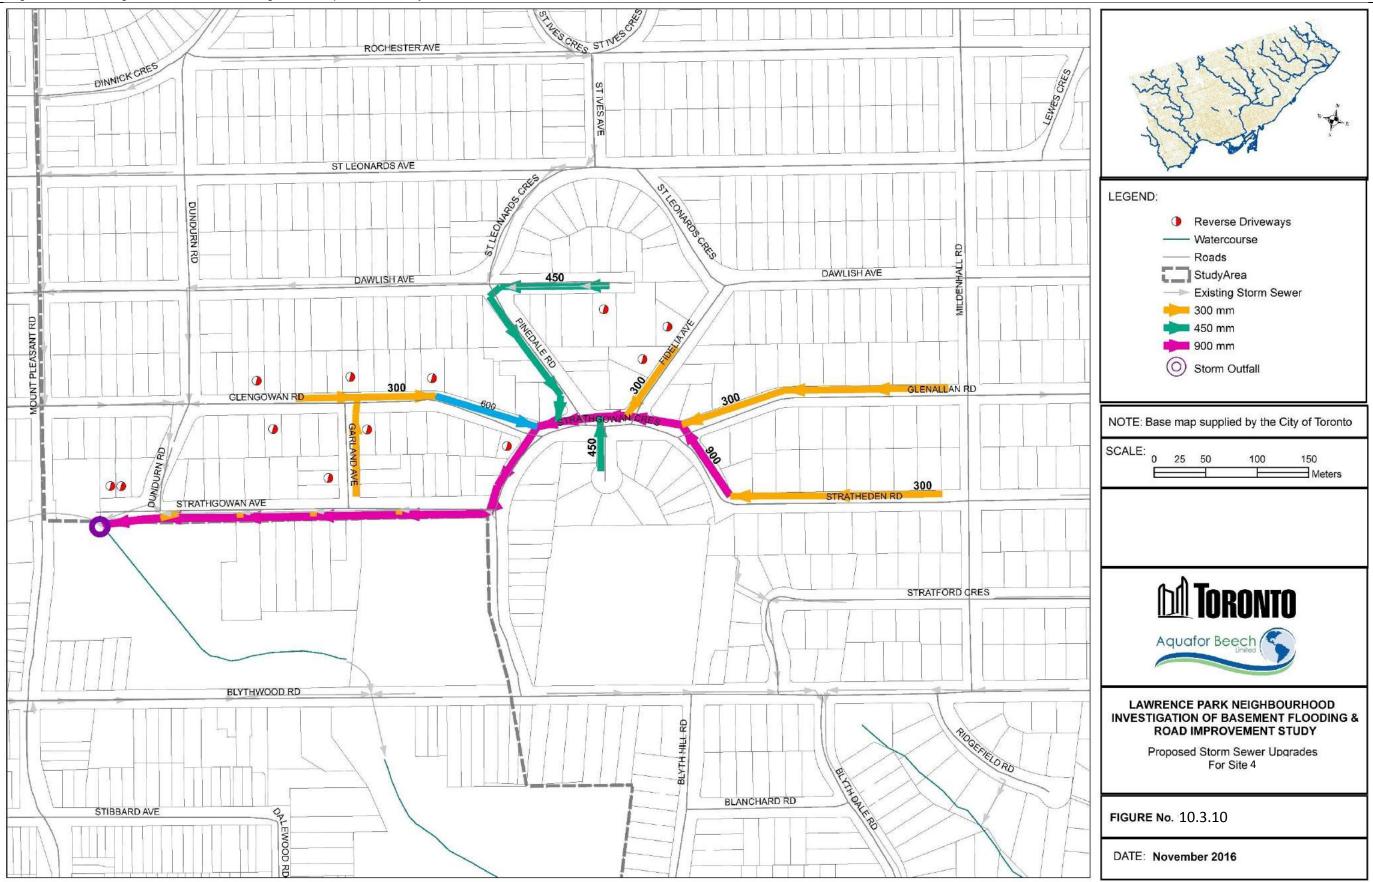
Proposed Storm Sewer Upgrade for Site 4
